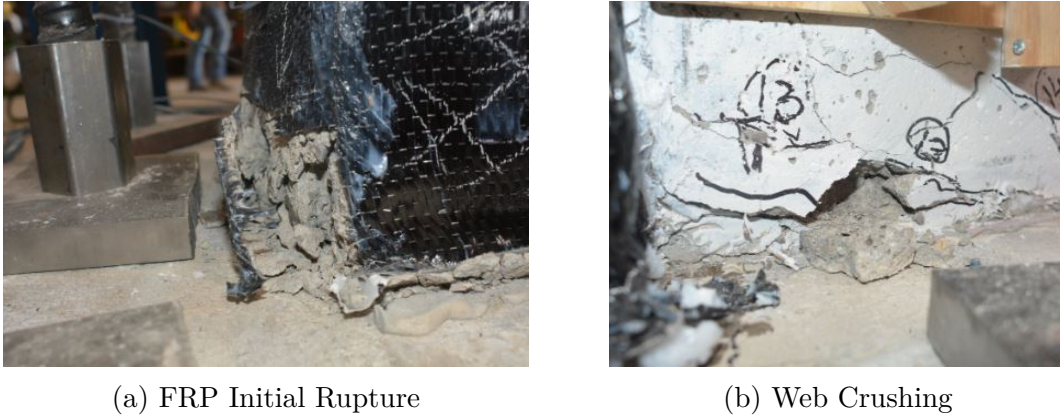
Wall State of Specimen S1FP at 1.5%
